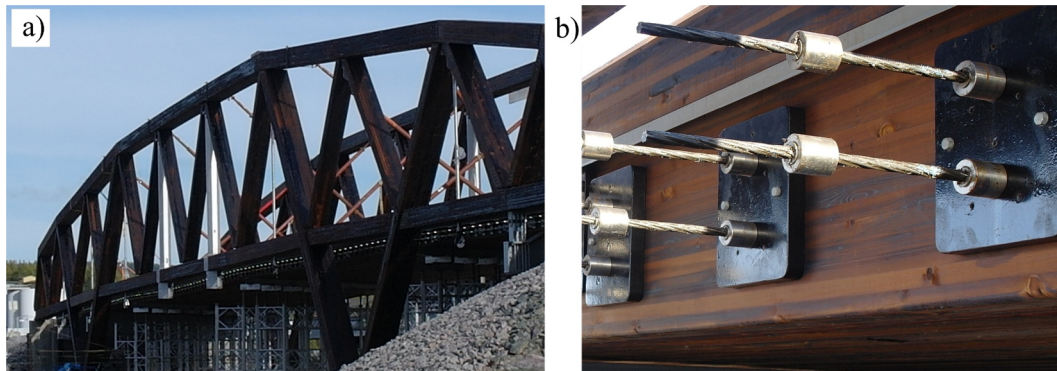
a) Norsenga Bridge in Kongsvinger, Norway; b) Detail of the pre-stressing system.
